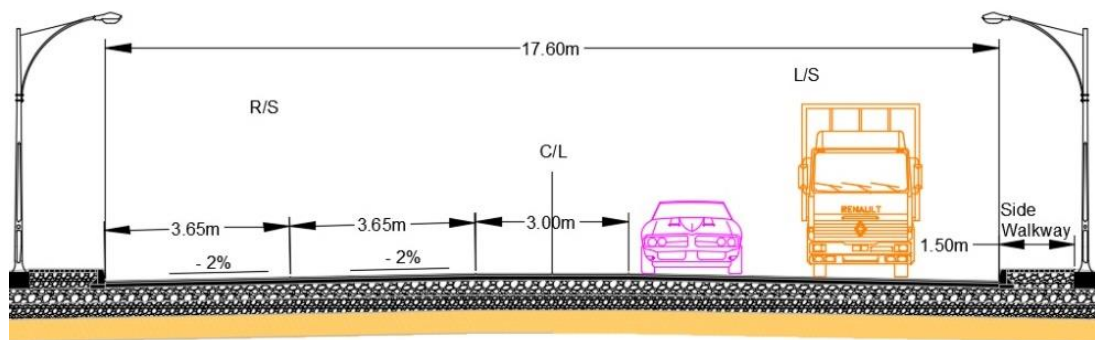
Proposed Typical Cross Section for Parachinar-Thall Road
